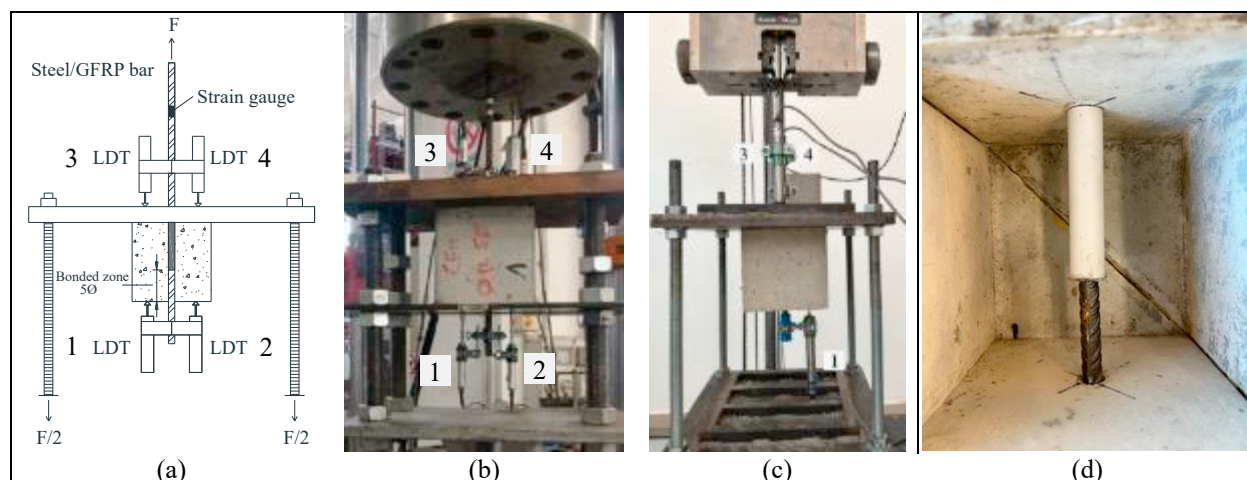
Pull-out test set-up (a); specimen before the pull-out test in UniSa Lab (b) and UniSal lab (c); casting direction (d).
